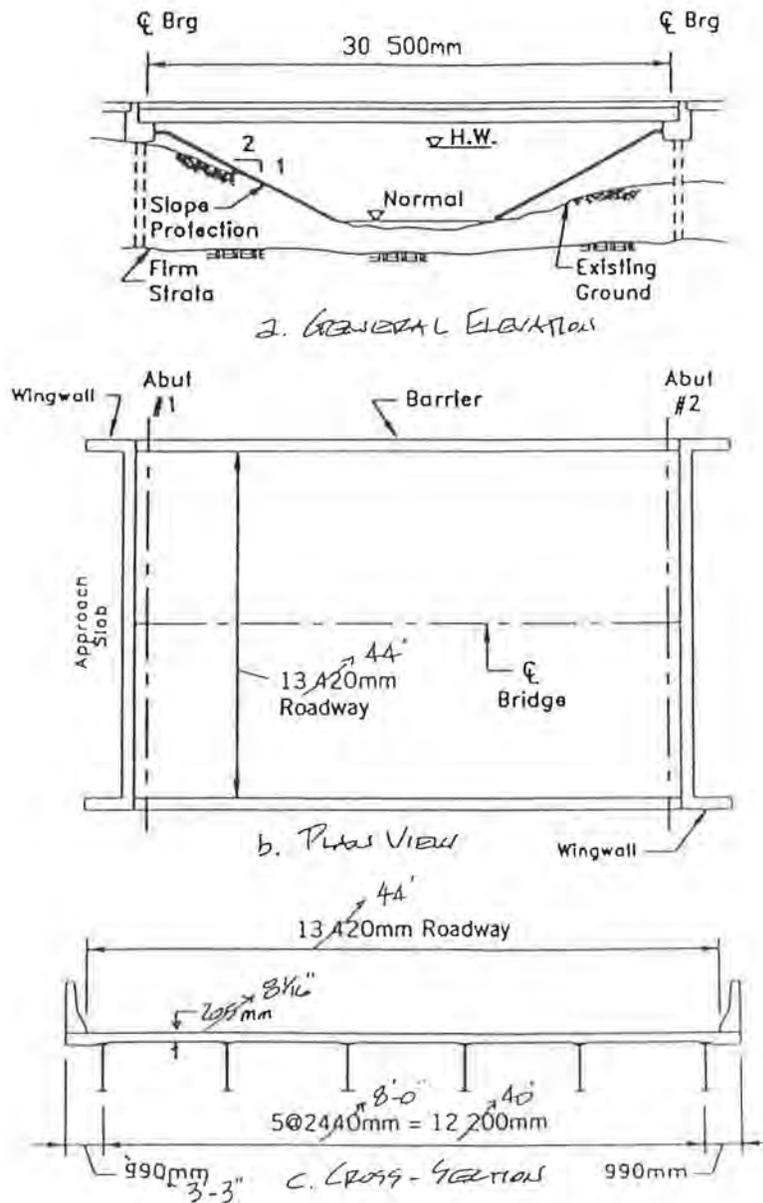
Noncomposite rolled steel girder bridge design example ().
